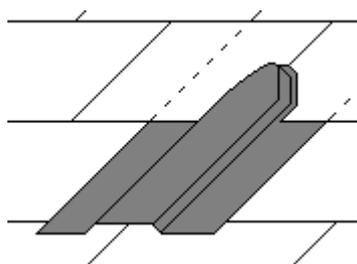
Shallow pitched roofs. On a lower pitched slate roof, the batslate can be extended down the roof to lessen the chance of water ingress.
